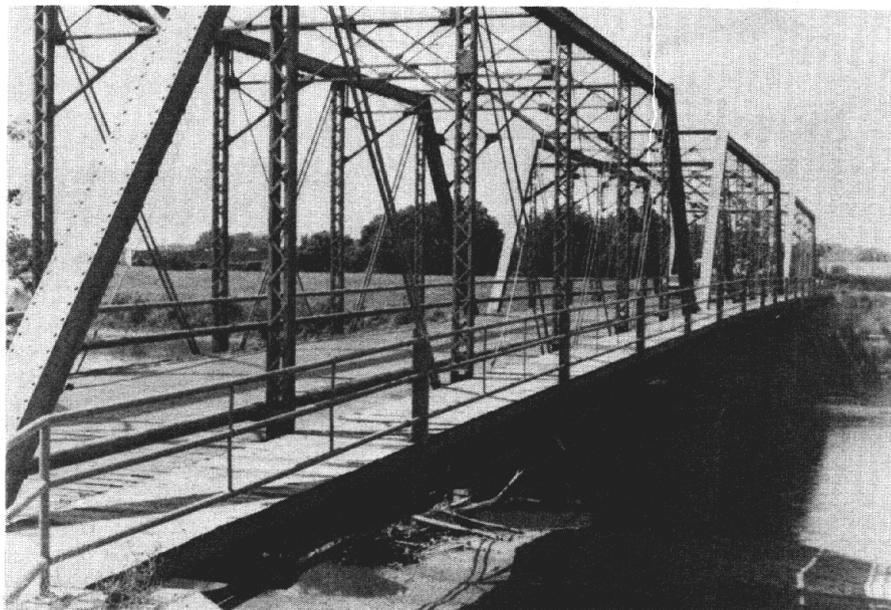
Jackson Street Bridge, Raccoon River, Des Moines.
